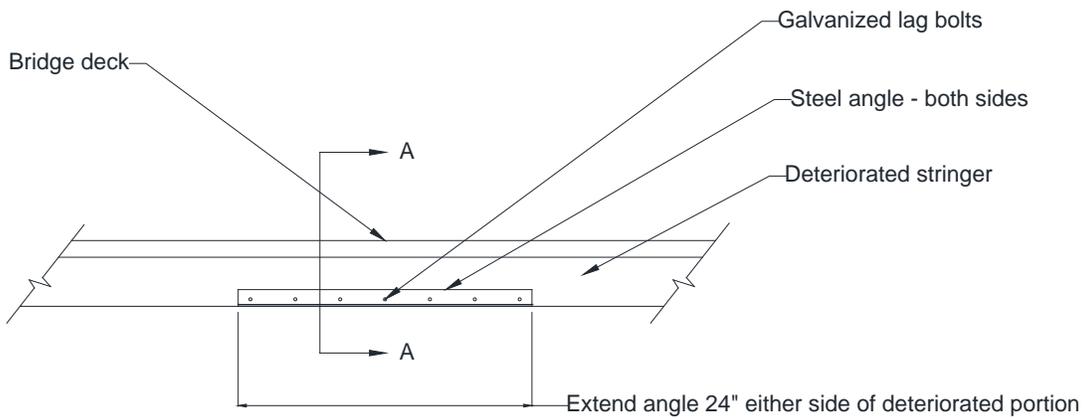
Strengthening of timber girder or stringer – flexural reinforcement, bottom angle
